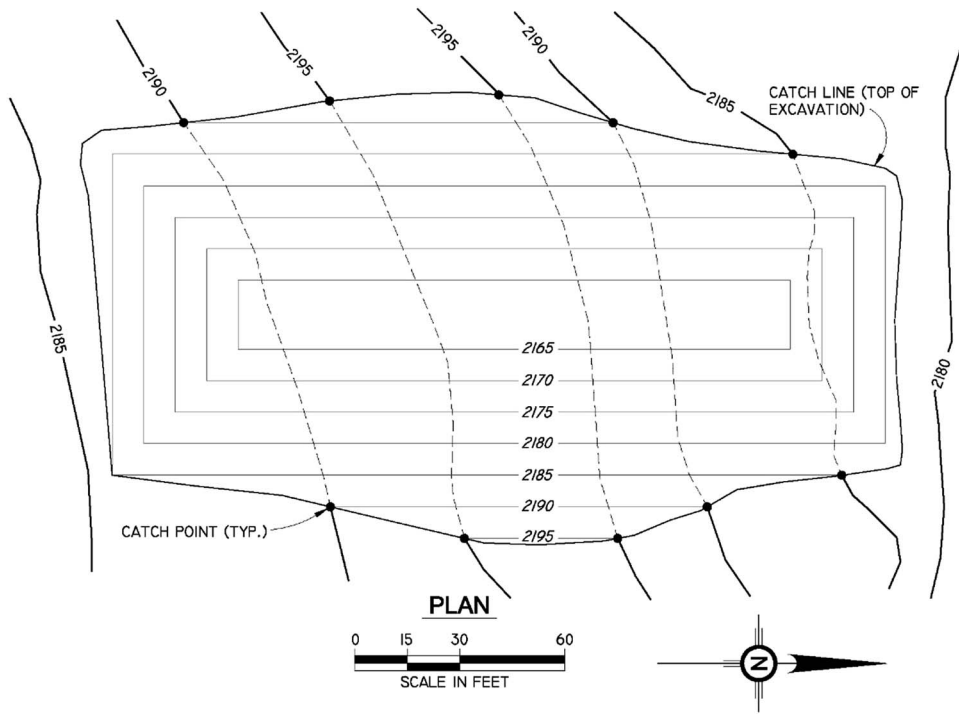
Plan of Pond Excavation Shown Using New Contour Method
